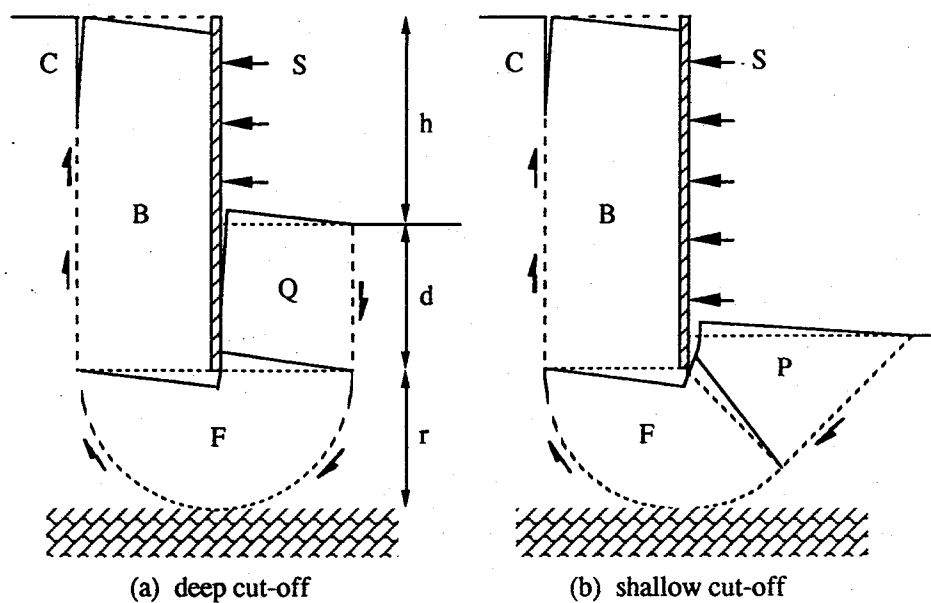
Base heave deformation mechanisms for strongly supported excavations
